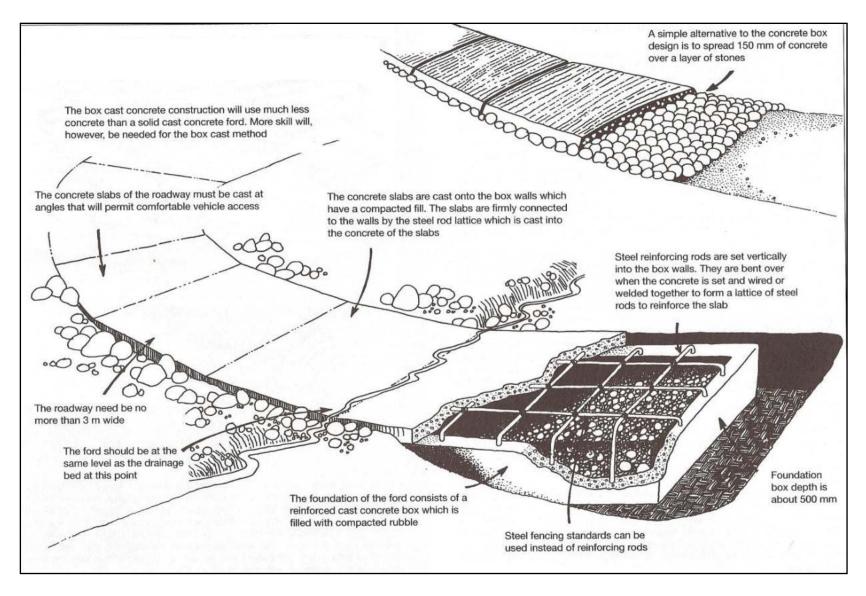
Concrete ford for drainage crossings (Source: Coetzee, 2005)
